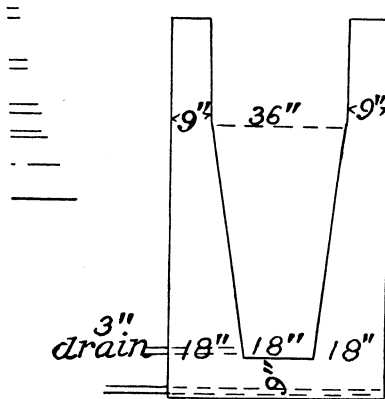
Showing a transverse section of swimming vat built of concrete or brick and cement.
